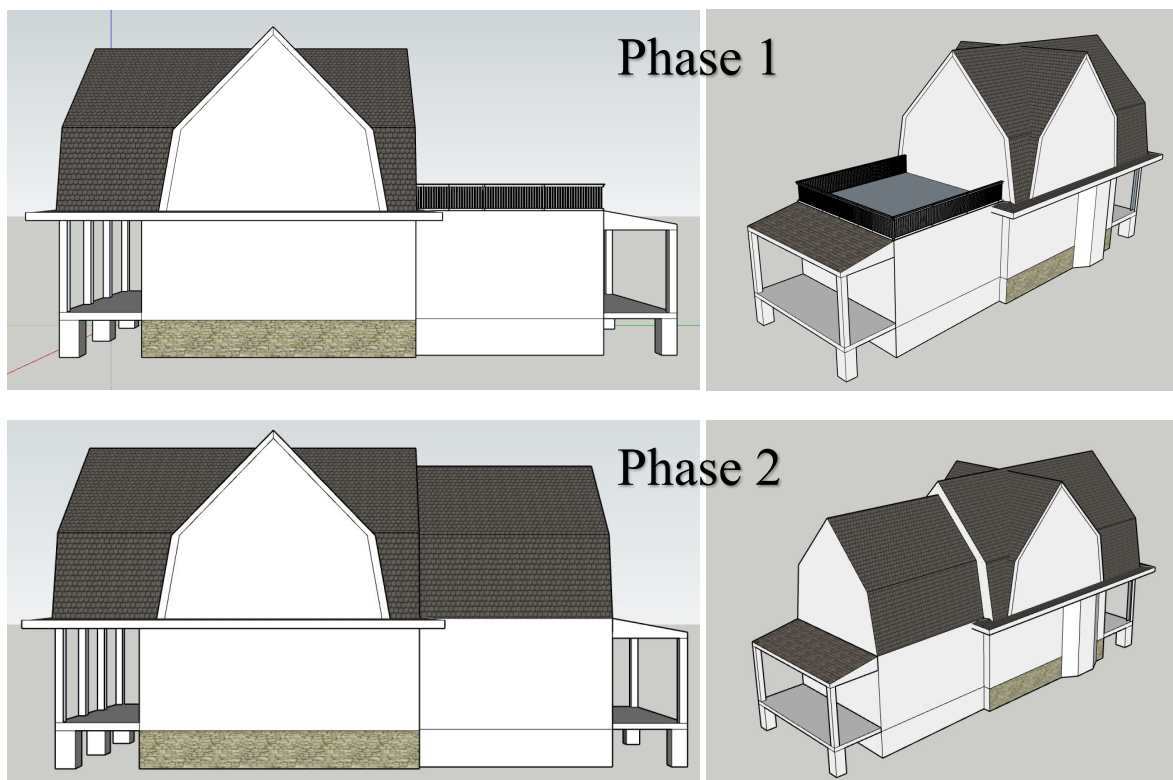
Example of a side-gambrel house with one-story wings. One of the wings is an infilled porch.
